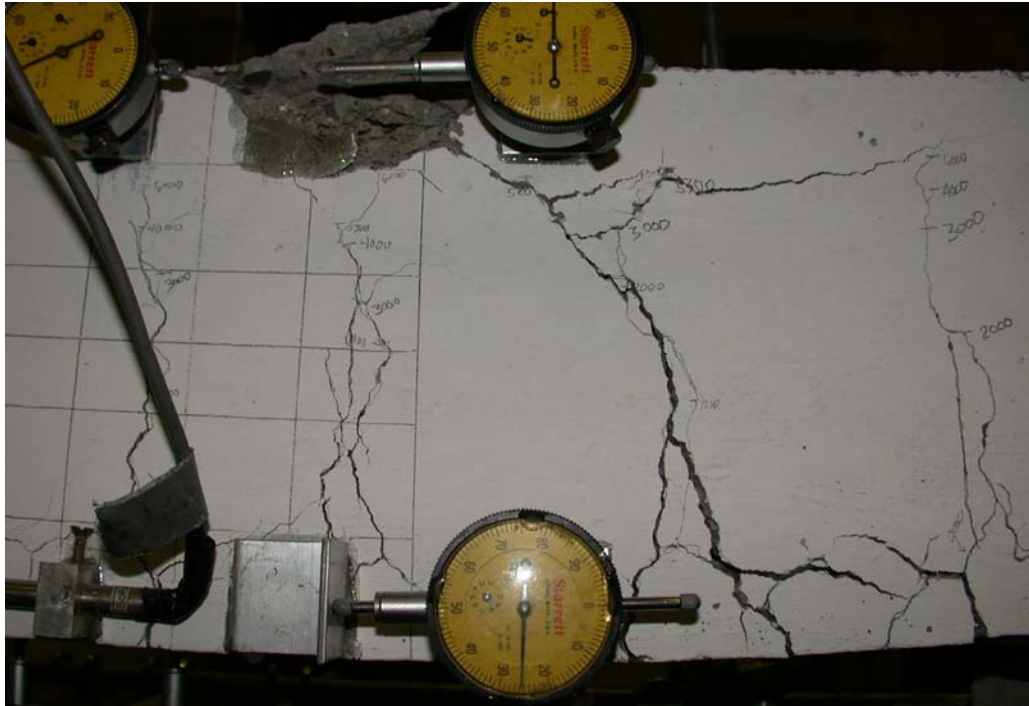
Crushing Failure of Compression Zone of Beam P-2 and Flexural Cracking.
